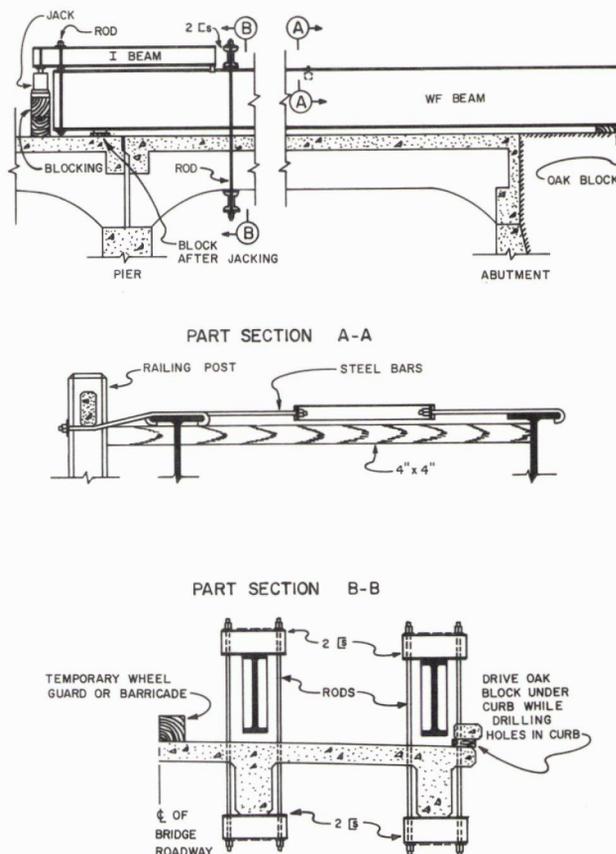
System to lift deck span while making repairs to pier caps or bearing pads, Virginia Department of Highways.
